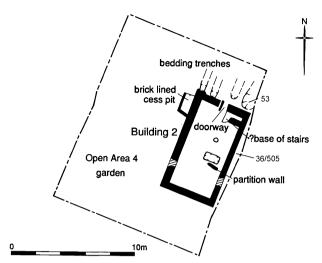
Battle Bridge Lane. Trench 3: building 2 and Open Area 4
